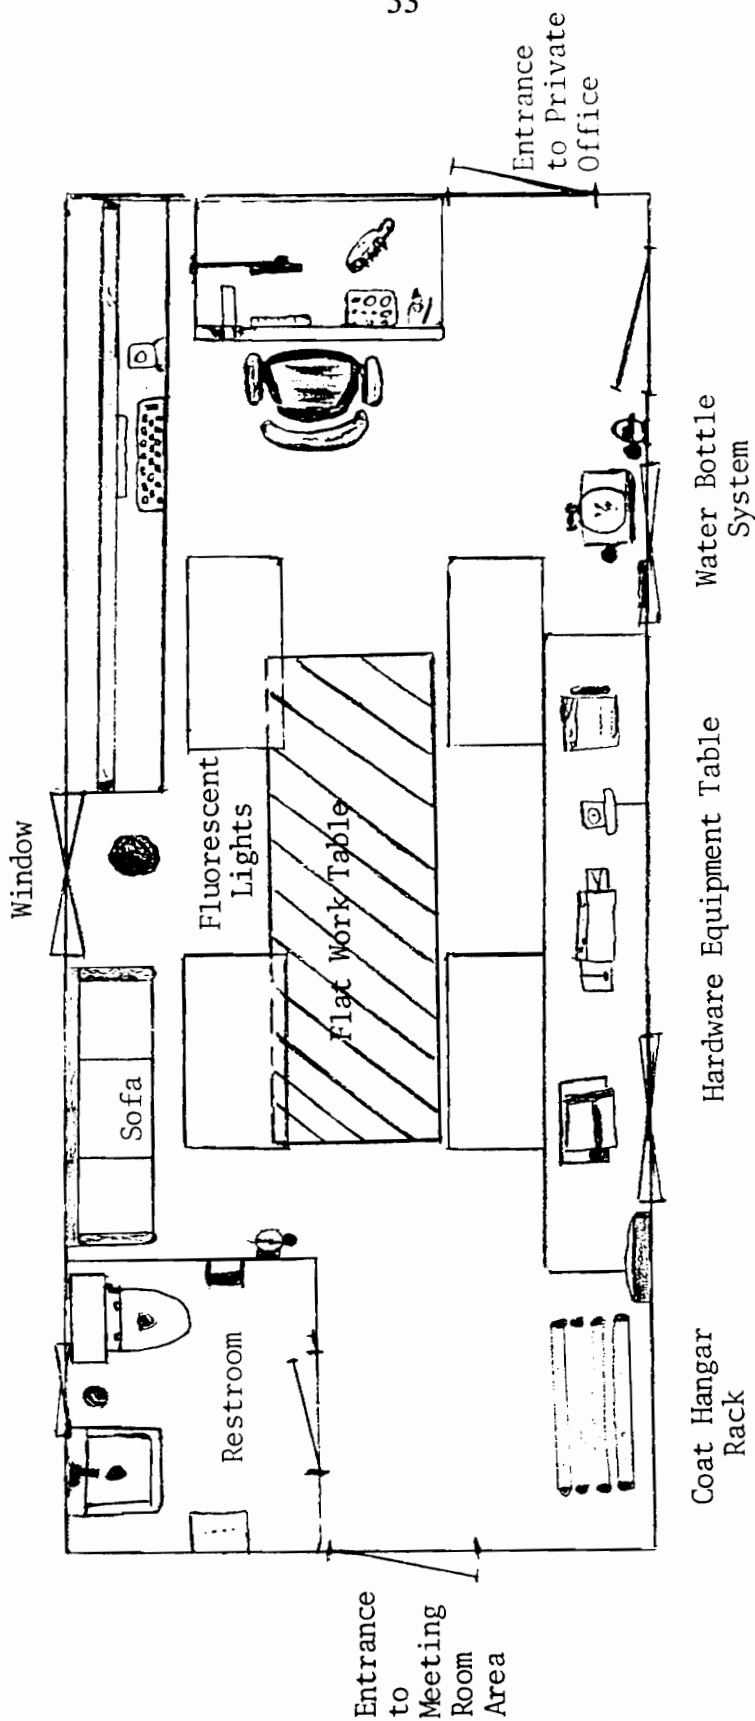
Conceptualized Layout Sketch of Workbench Area (Top View)
